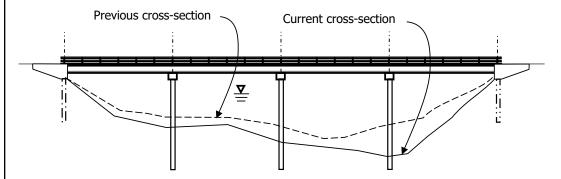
Elevation view showing current cross-section and previous cross-section for a bridge over water.
